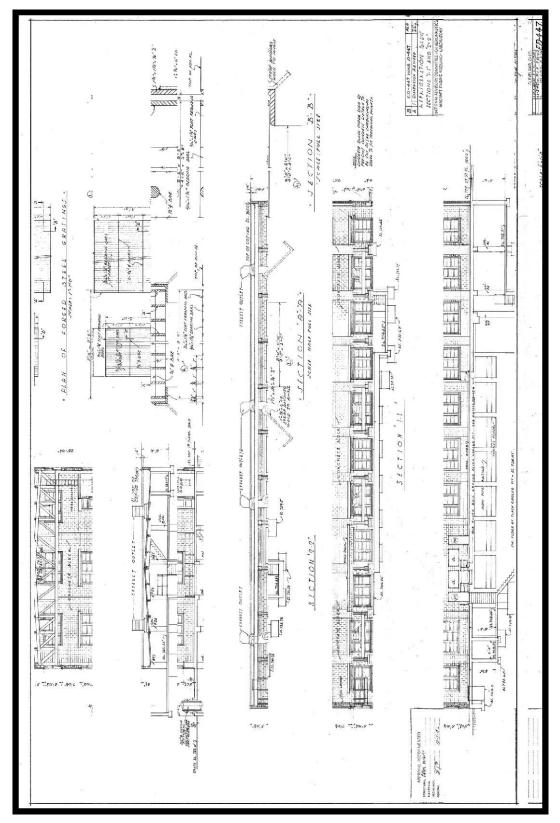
Sections and cross sections of the Refrigeration Building, 1942 (OH_Cuyahoga_AWT-Support_058).
